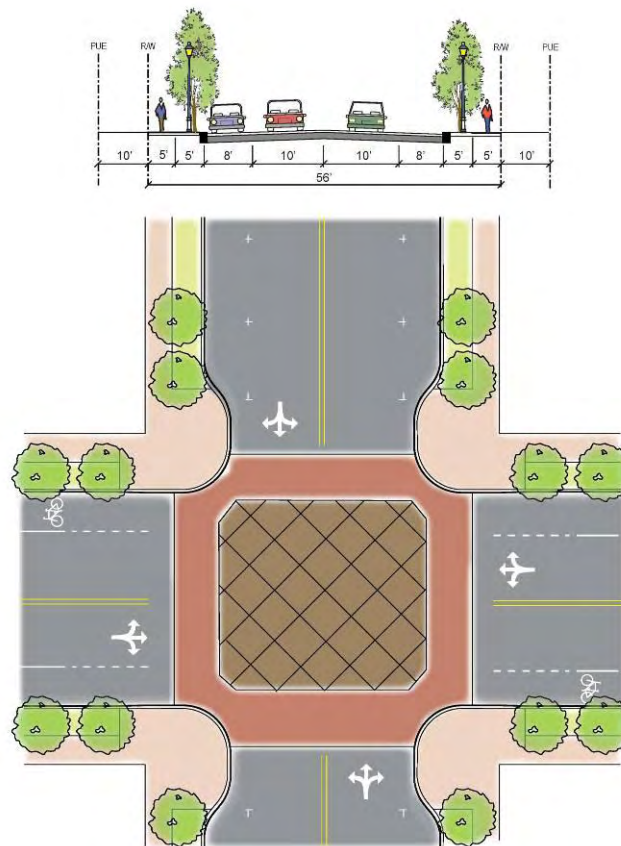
Typical 2-Lane Residential Street With Parking on Both Sides
